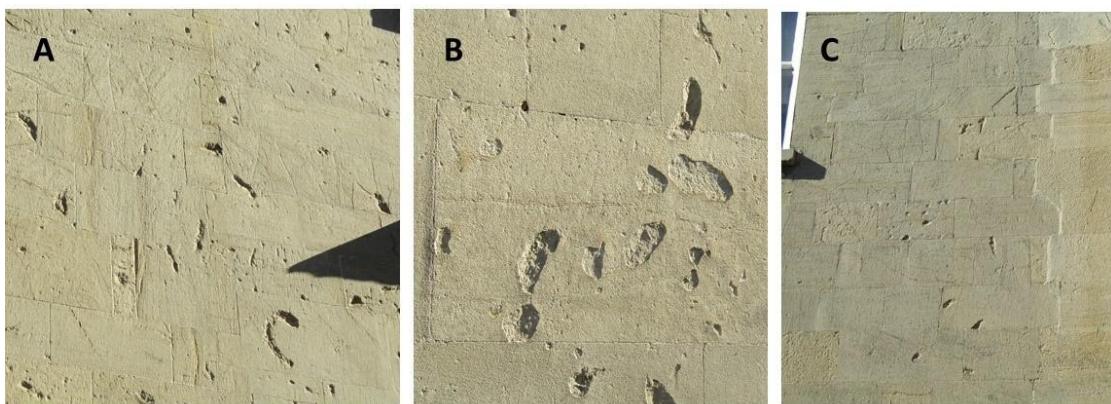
Could these marks be from machine-gun bullets? A: elongate, downward-directed marks on a wall of Miles’s Buildings, B: on Jane Austen’s house in Gay Street, and C: a wall in Gloucester Road Lansdown, where an adjacent house on right has clearly been restored.
